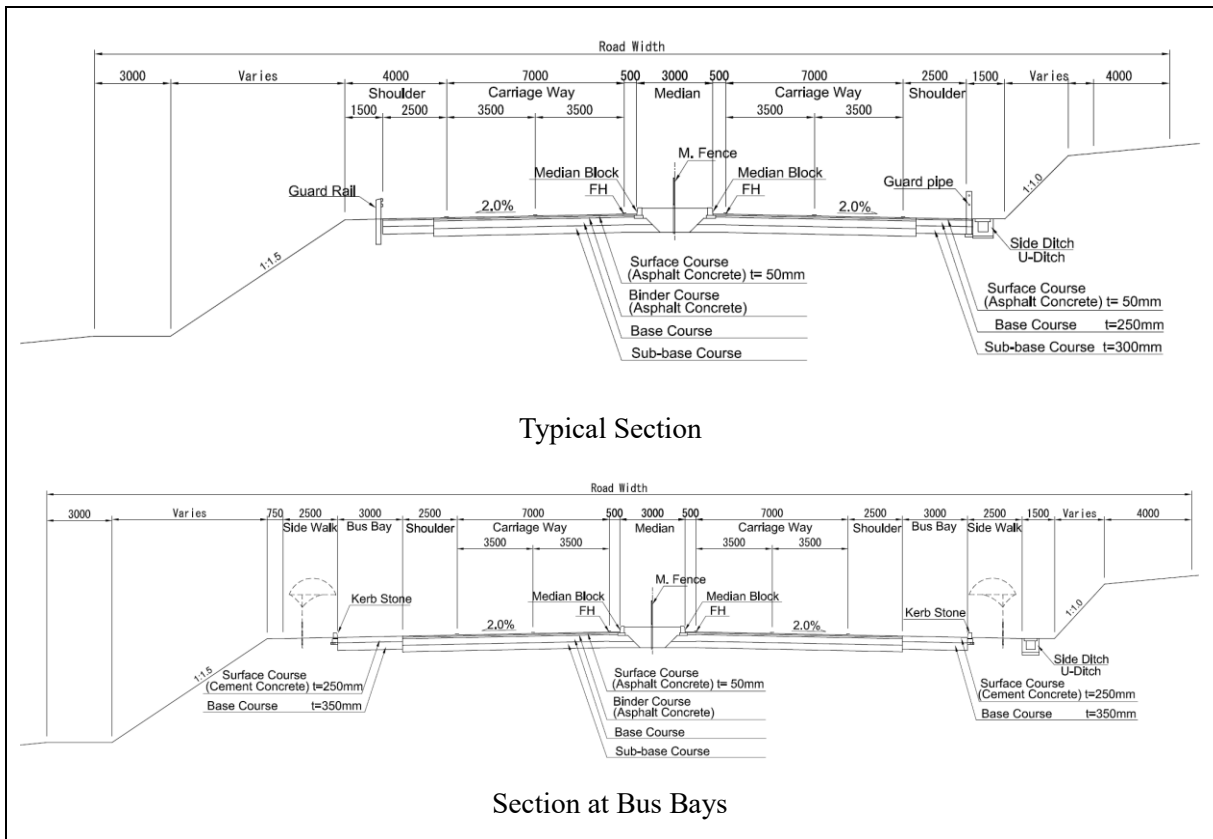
Typical Cross Section (Without Service Tracks) (Section 1, Section 5, Section 7 and Section 9)
